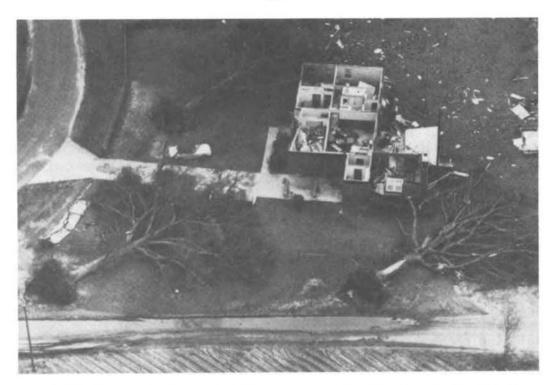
Typical roof failure caused by the South Carolina tornadoes. (Photograph courtesy The State.)
